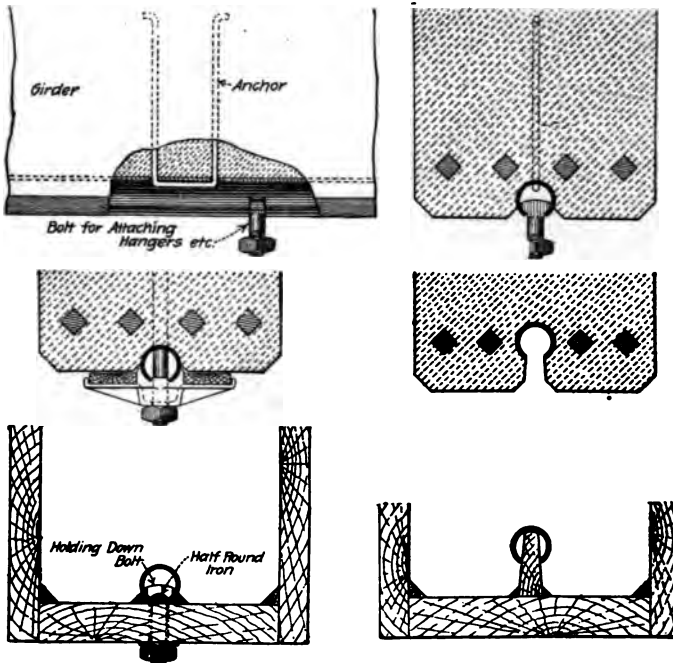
Sections of Pipe Slot Hangers and Forms for Constructing.
